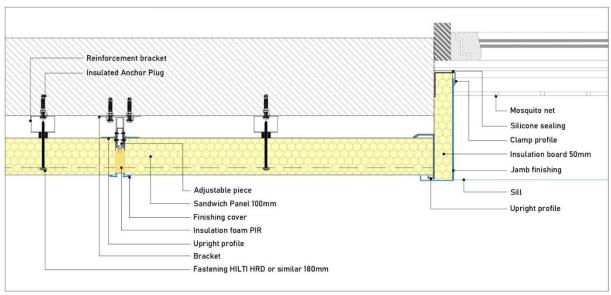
Horizontal section detail of Milan demo window [drawing created using AutoCAD]
